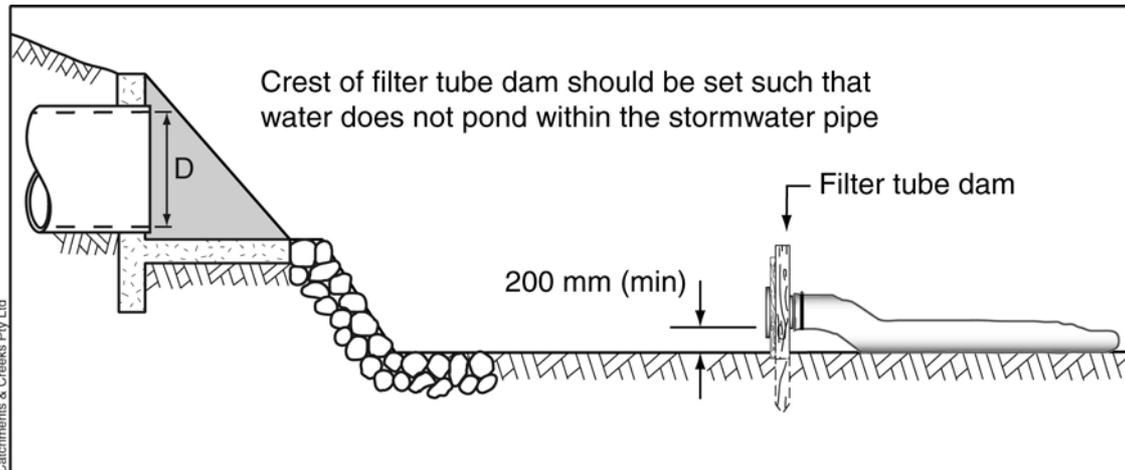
Filter tube dam placed downstream of an elevated stormwater outlet
